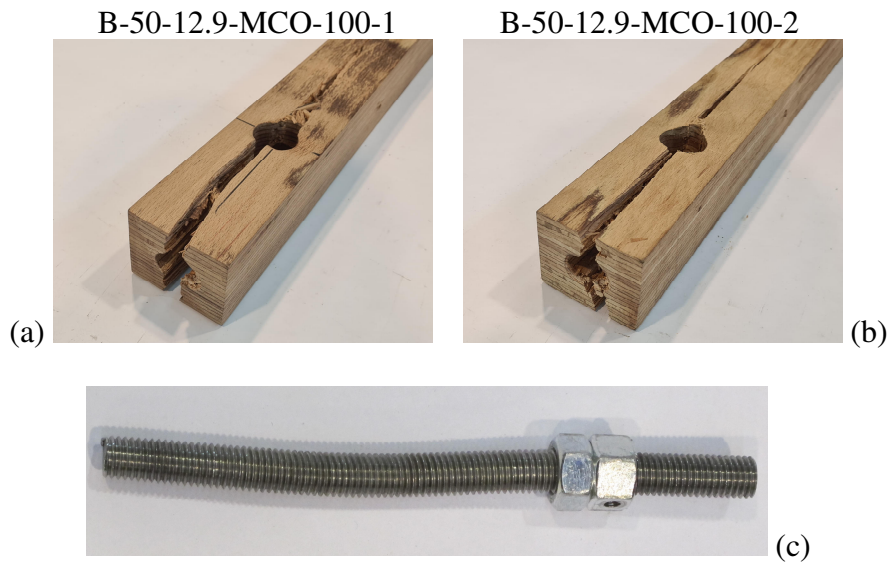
Non-preloaded specimens at the end of MTO tests: (a, b) splitting failure of the LVL member due to compressive stresses exerted by the dowel-nut and (c) buckling of the threaded rod.
